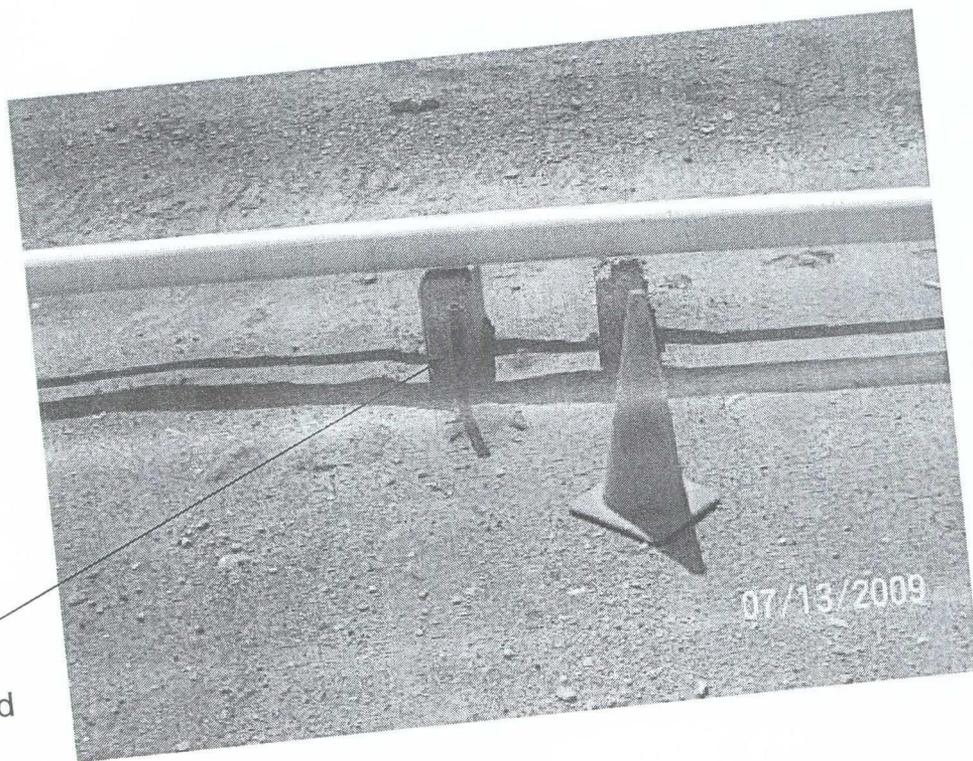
Photograph of emplaced pipe – the section with holes is inside the ground
